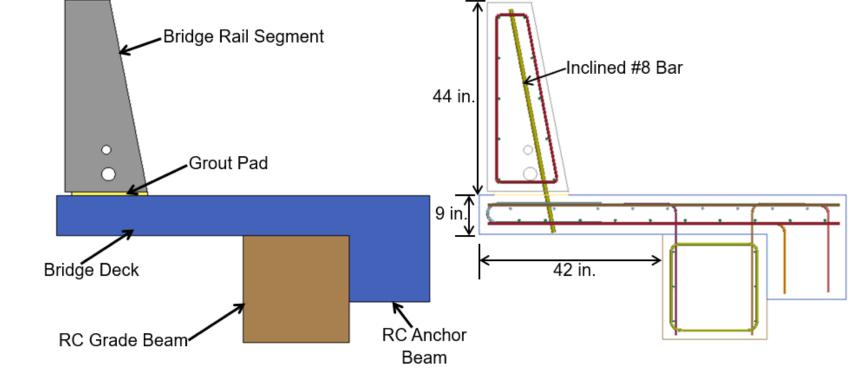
Overview of LS-DYNA Model of Bridge Deck, Grade Beam, Anchor Beam, and Barrier System for Single-Slope Barrier Shape
